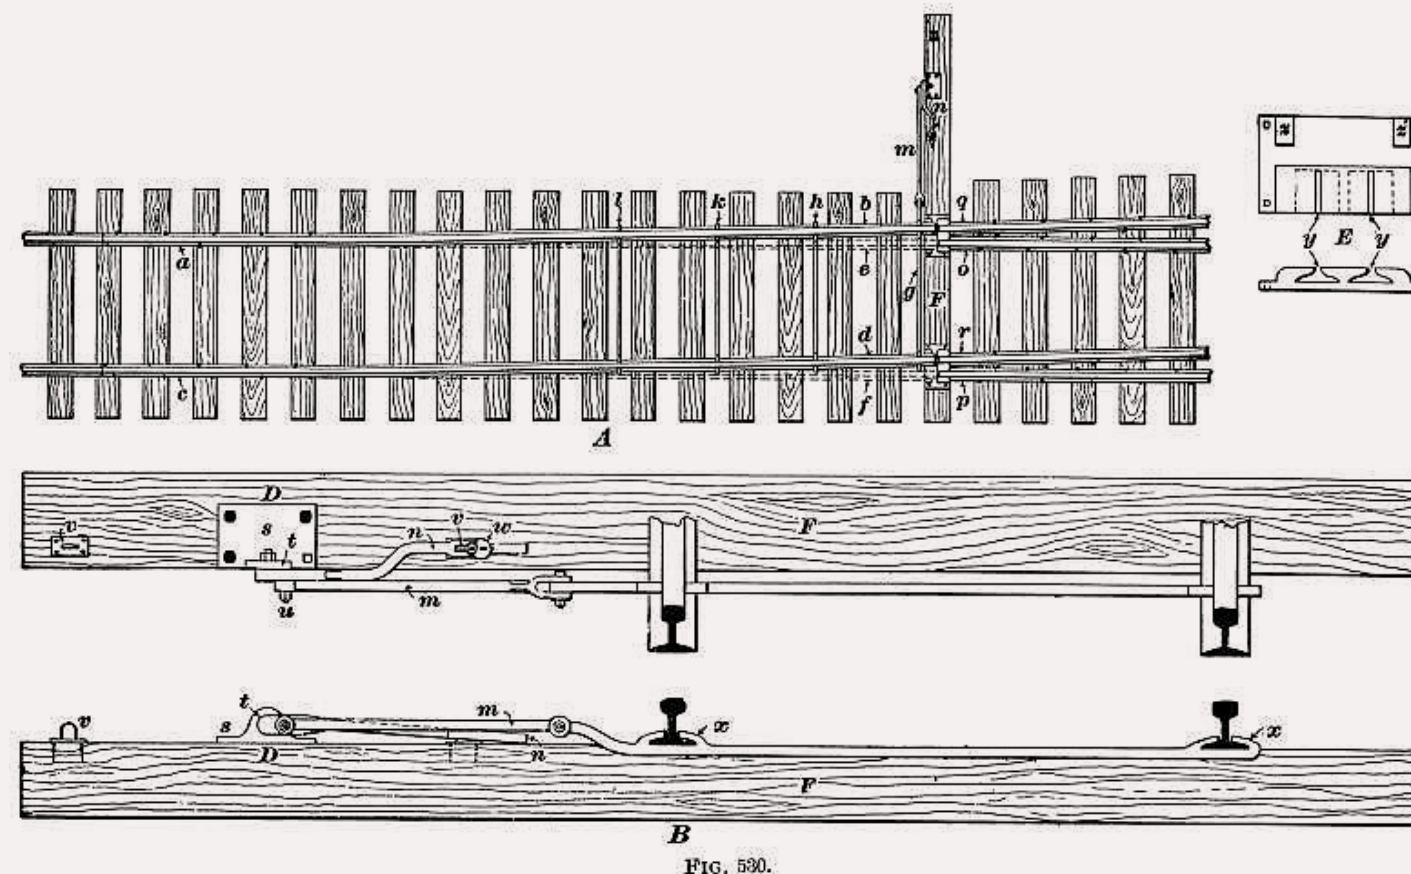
Original patent drawing of a typical stub switch. Notice the detail view showing the casting used to align all the rails.
